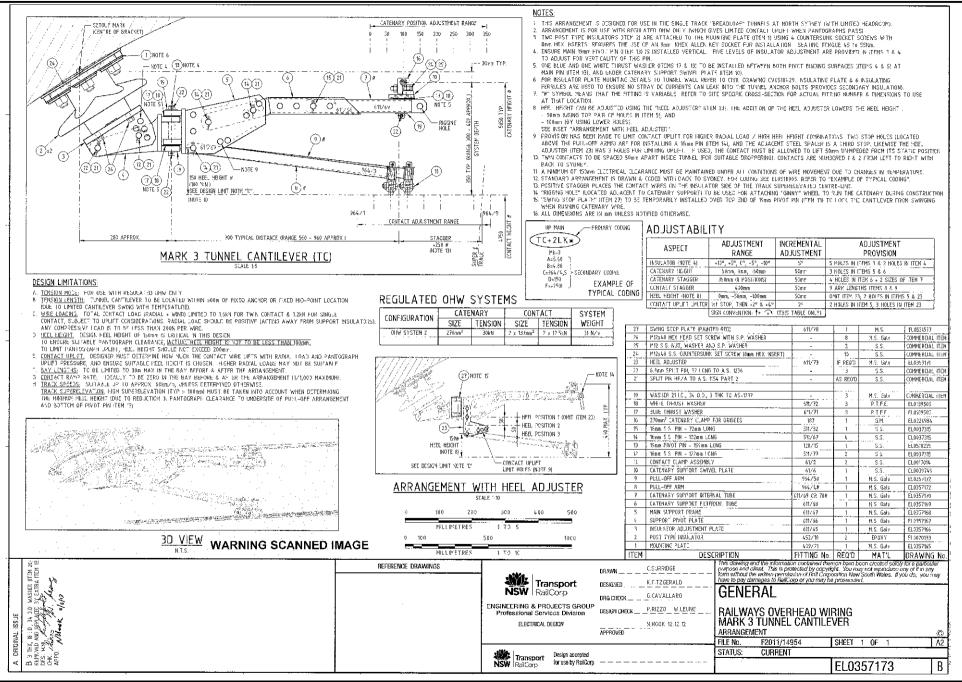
Mk-3 Tunnel Cantilevers Supporting OHW Around Reverse Trackwork
